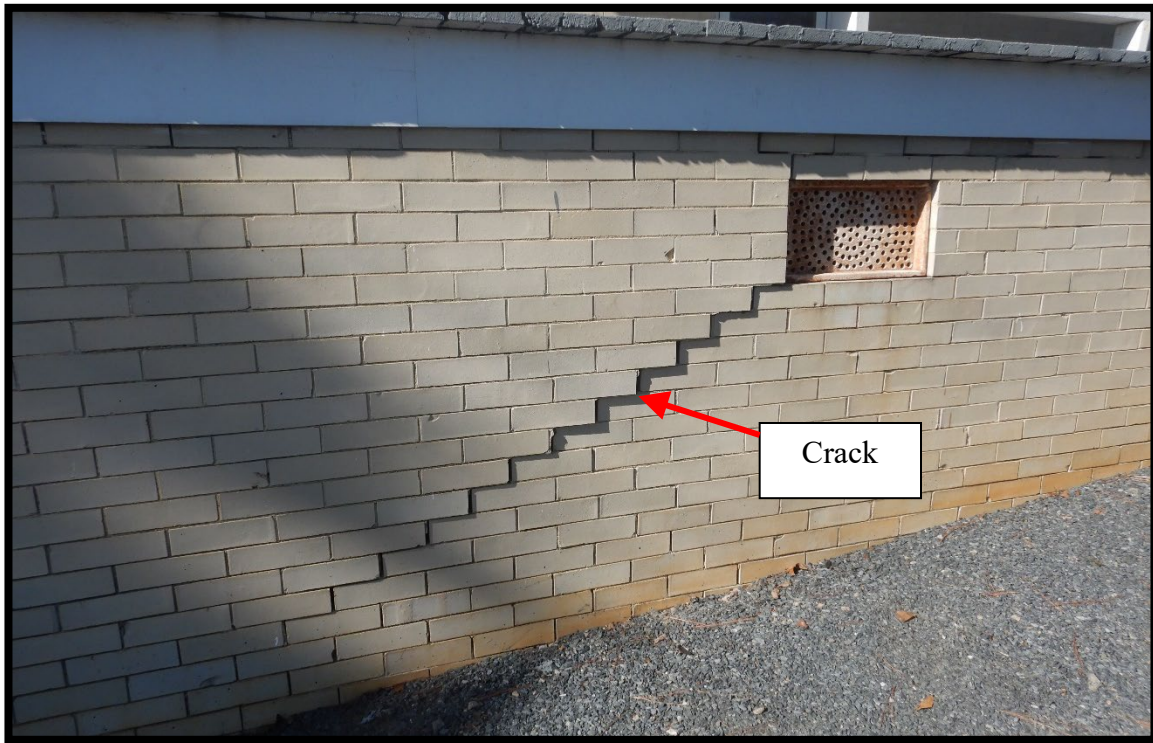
This inside of this wall is in photo 23. The brick is single wythe.
